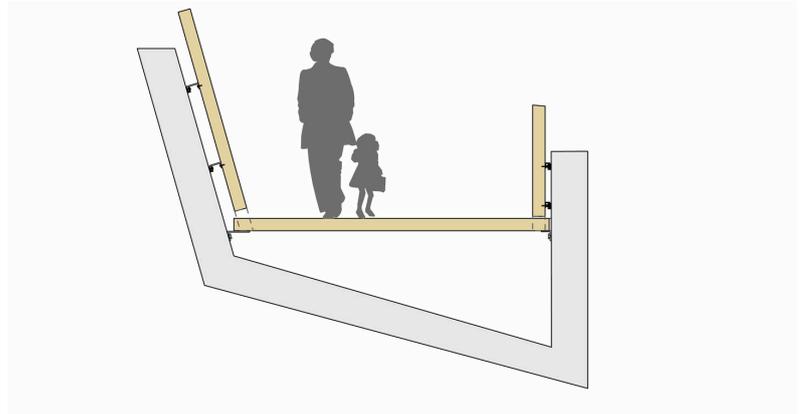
2b Architectes. 2015. La Sallaz Footbridge walkway section.
